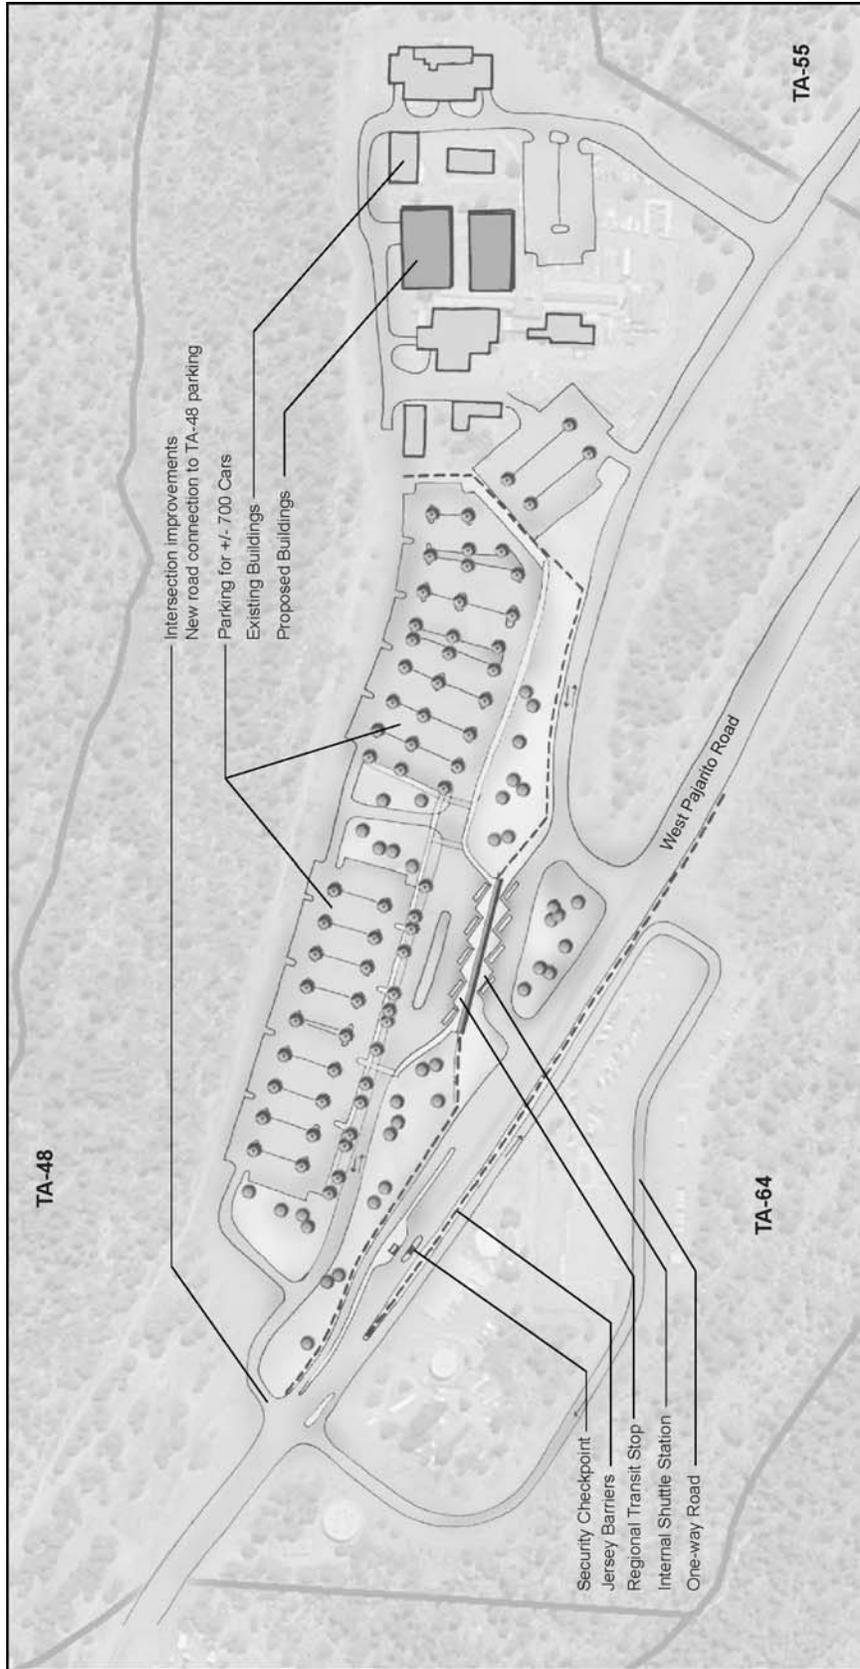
Proposed Technical Area 48 Security-Driven Transportation Modifications
